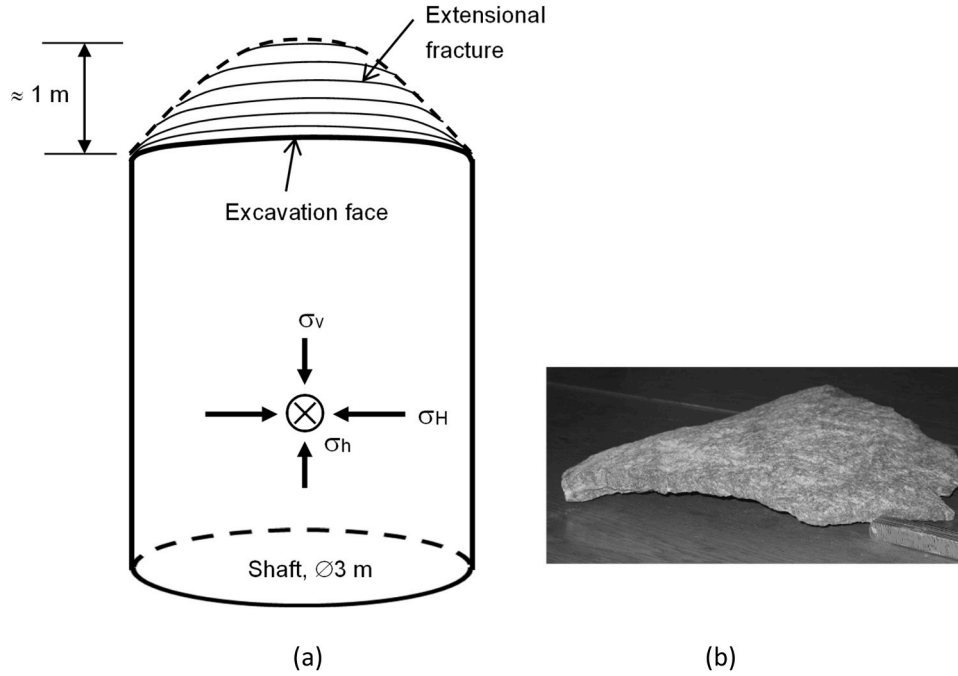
Extensional fractures behind the excavation face of a vertical ventilation shaft: (a) a sketch illustrating the extensional fractures, and (b) a rock slab that was scaled down from the shaft's excavation face.
